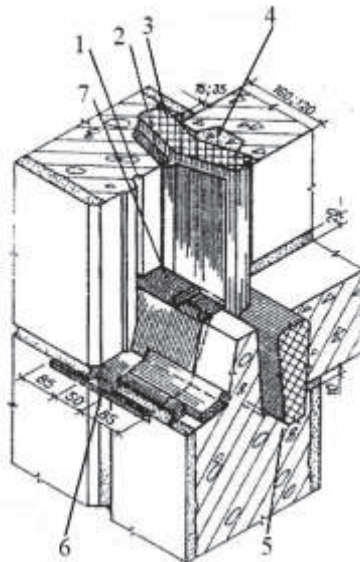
Drainage joint: 1 - decompression channel; 2 - air protection film; 3 - vertical thermal liner; 4 - concrete M150-200; 5 - horizontal thermal liner; 6 - leaky section of the horizontal seam; 7 - elastic gasket for the length of the drainage channel 220 mm
